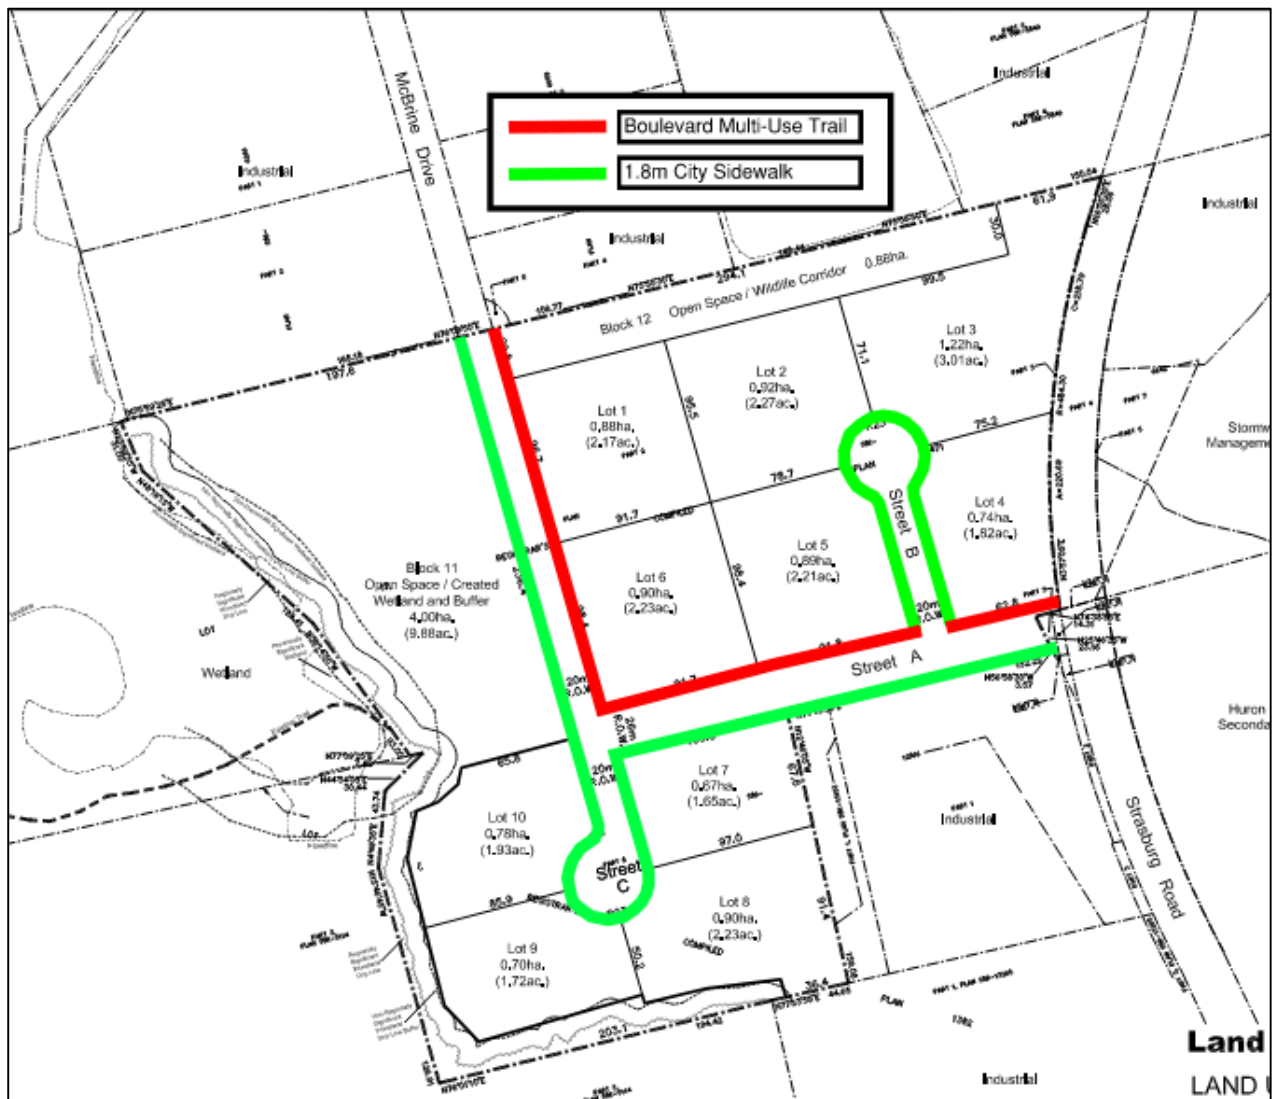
Map Highlighting the BMUTs and Sidewalks abutting the Roads within the Proposed Subdivision.
